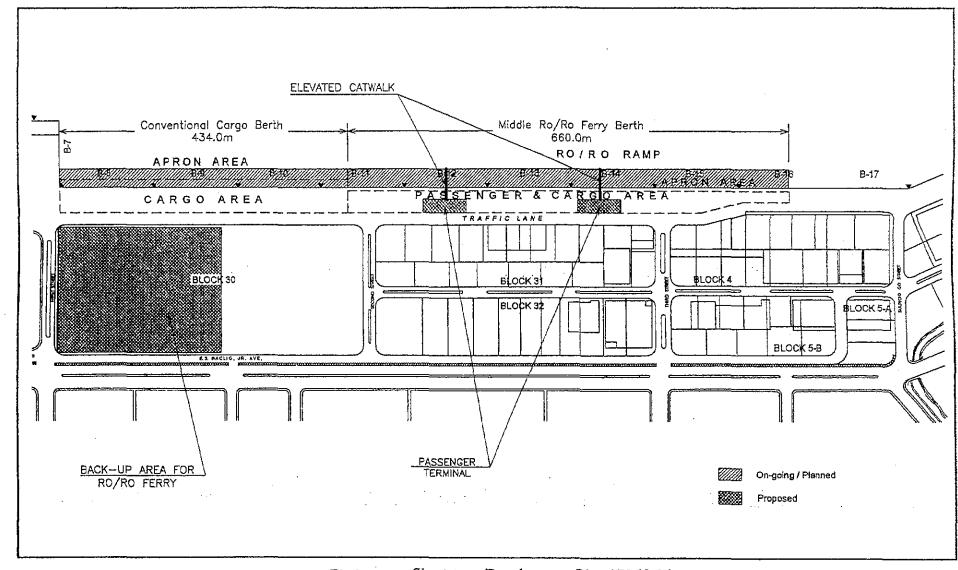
Short-term Development Plan (PMO 2)
